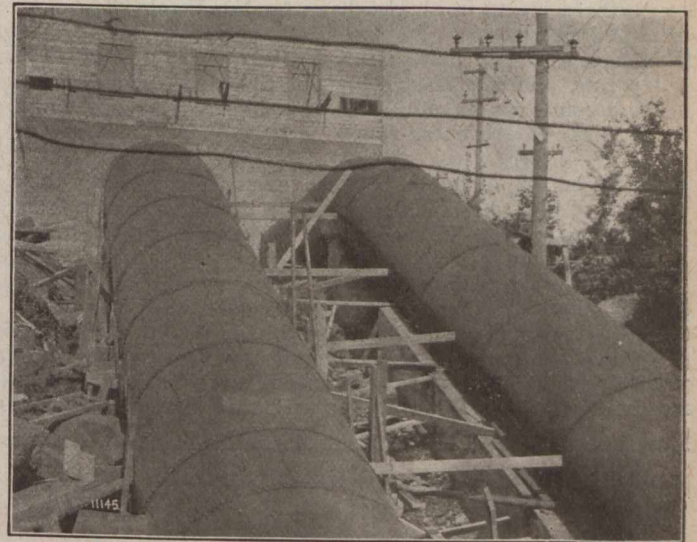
BIG CHUTE PENSTOCK, 9-FT. DIAMETER, WITH SINGLE AND DOUBLE-RIVETED LAP JOINTS
